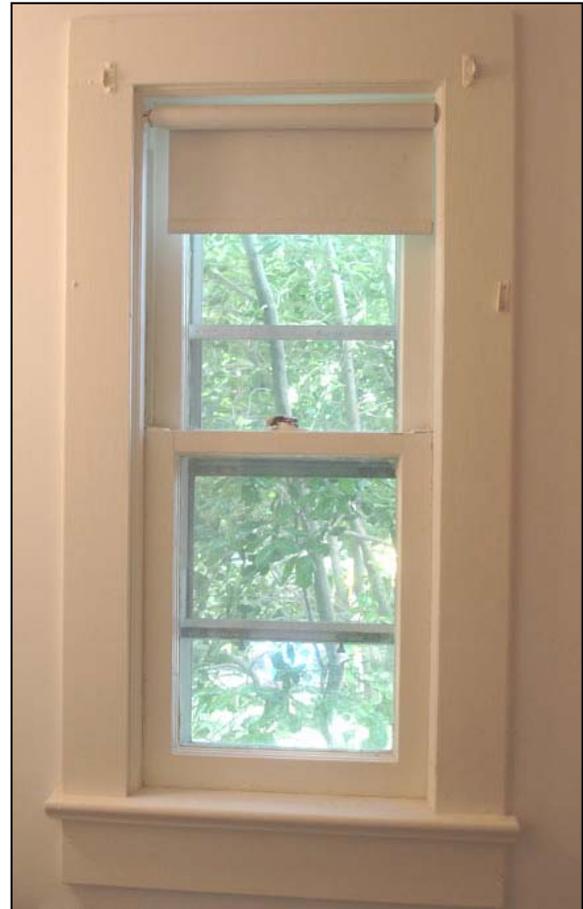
Gray Cottage, Room 106, W108 depicting elements typical of bathroom window openings, 2009.
